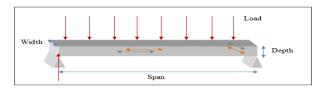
Beam with action forces (Basic civil engineering, 2015)
